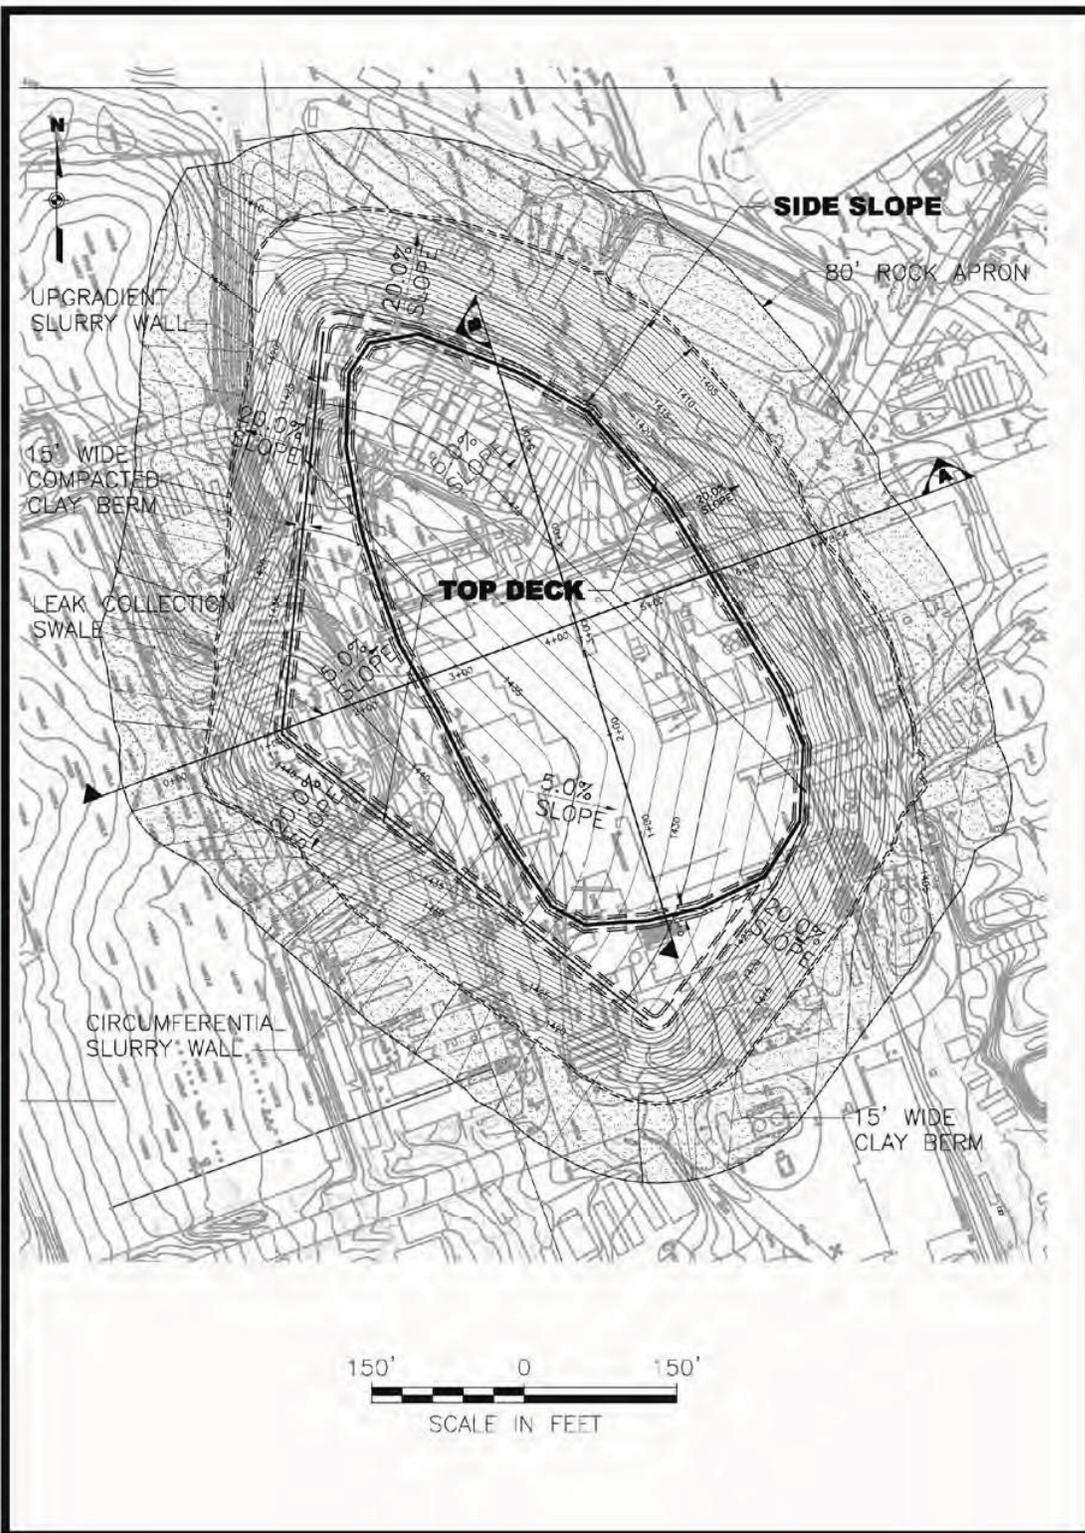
(Figure 2-15 in Sitewide report) North Plateau Cap and Barrier Walls
